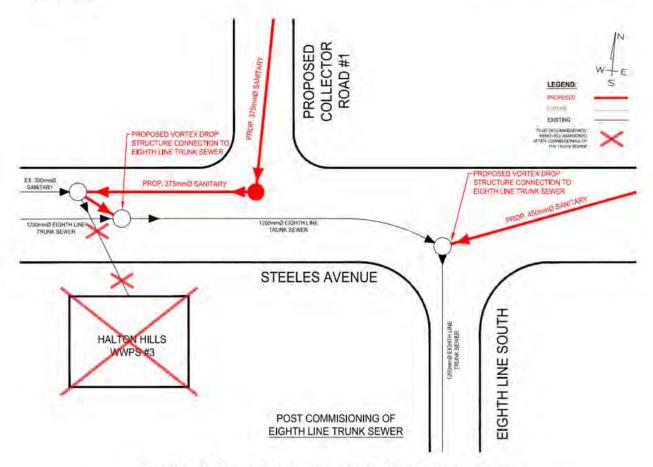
Proposed Outlet to Eighth Line Trunk Sewer
